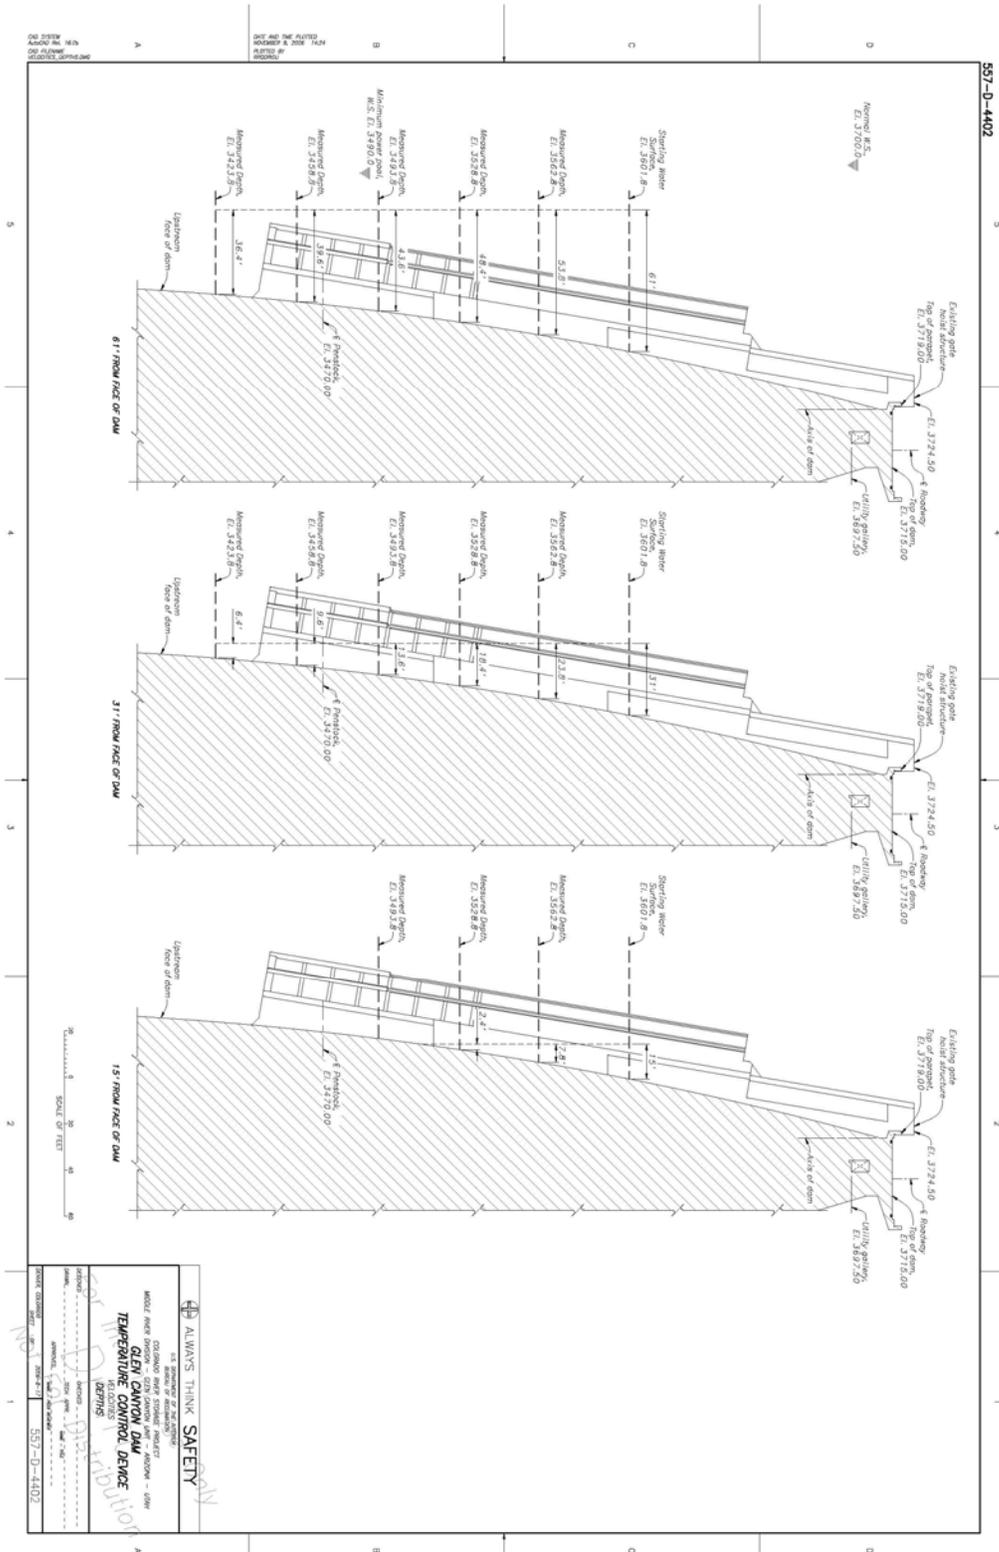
Working drawing that contains the locations of water current measurements with respect to the dam face. Cross sections through the trashrack structures show the locations for the three measurement planes.
